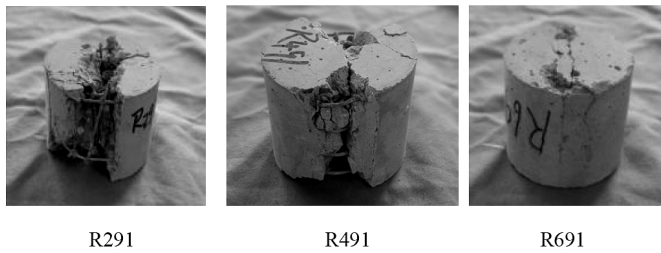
Reinforcement form effects on concrete failure pattern.
